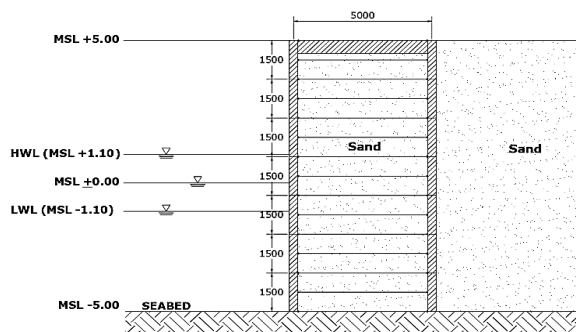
Parallel concrete panel cross-section with horizontal tie rod configuration (Type B)
